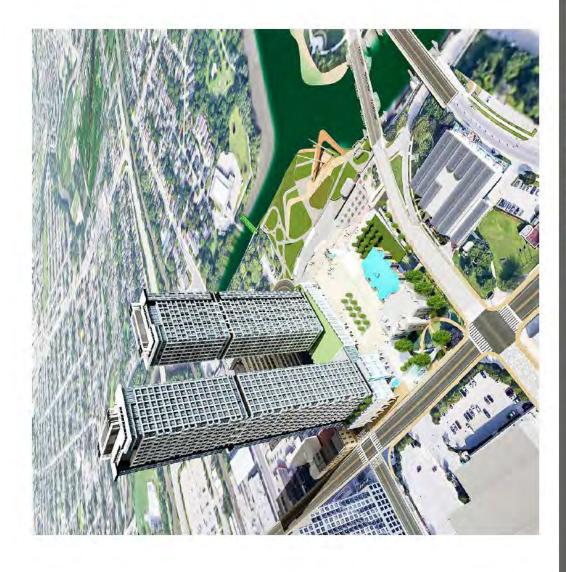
Proposed site plan (Zedd Architecture, 2022).
